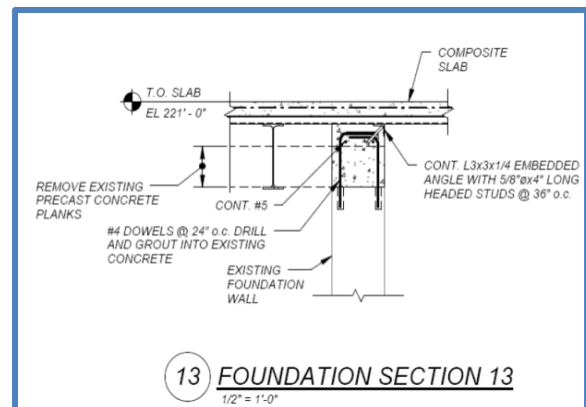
Detail of New Foundation Wall Poured on Top of Existing Foundation
